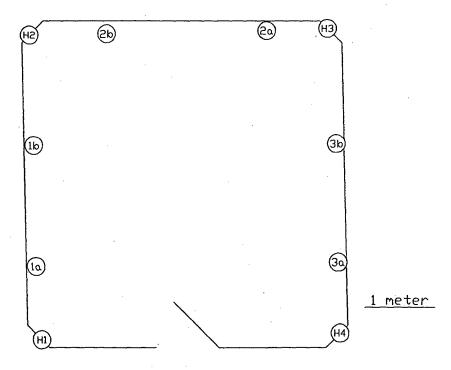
Scale drawing showing location of pressure transducers inside bombproof chamber.
